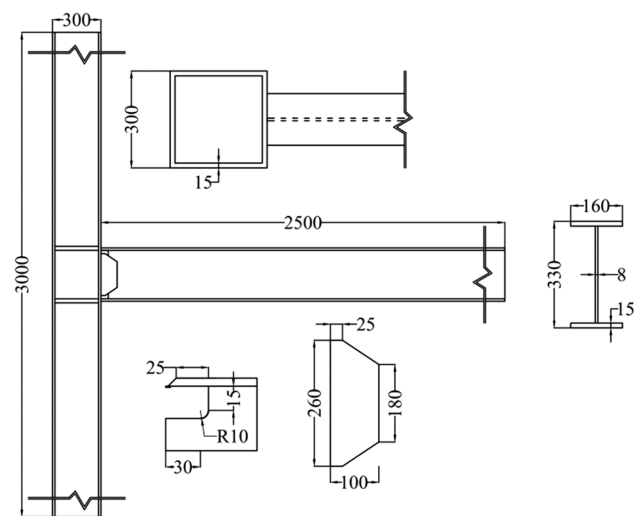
Specimen DC-S tested by Nia et al. (2013) (dimensions in mm)
